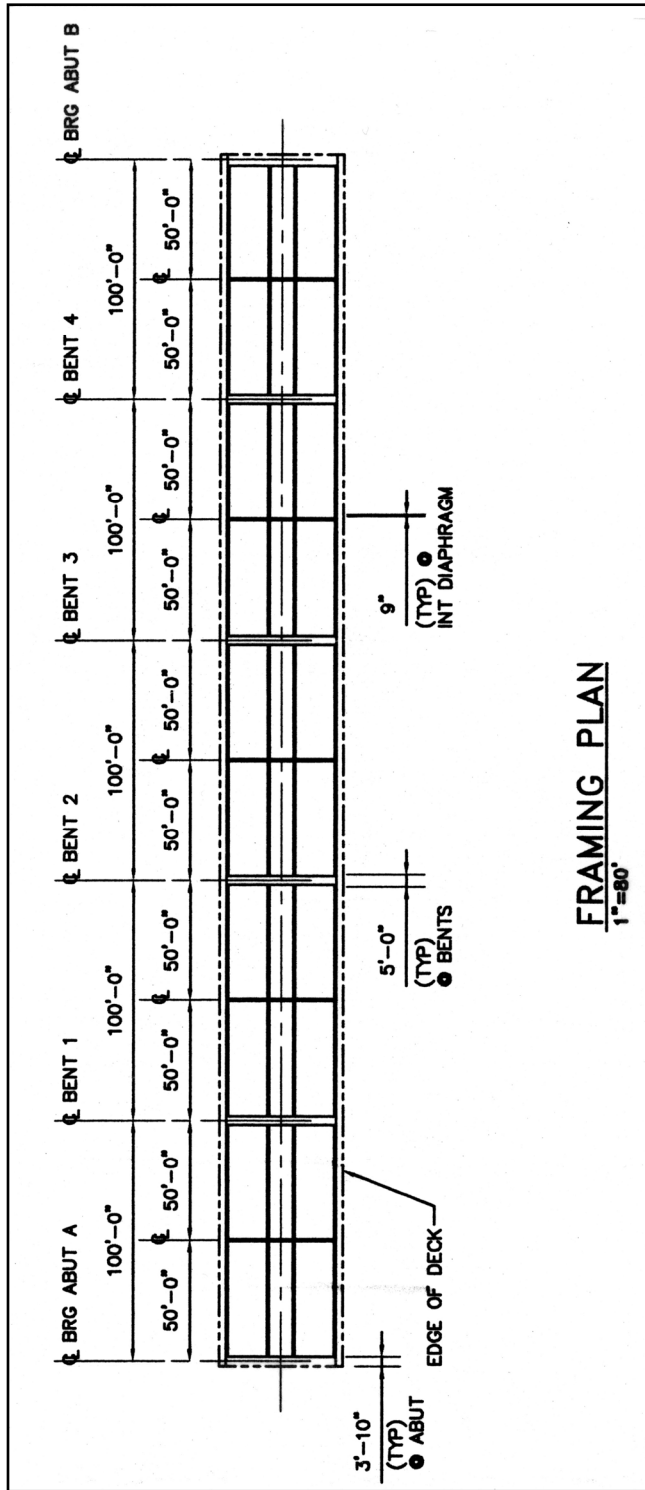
Bridge No. 8 - Box Girder Framing Plan
